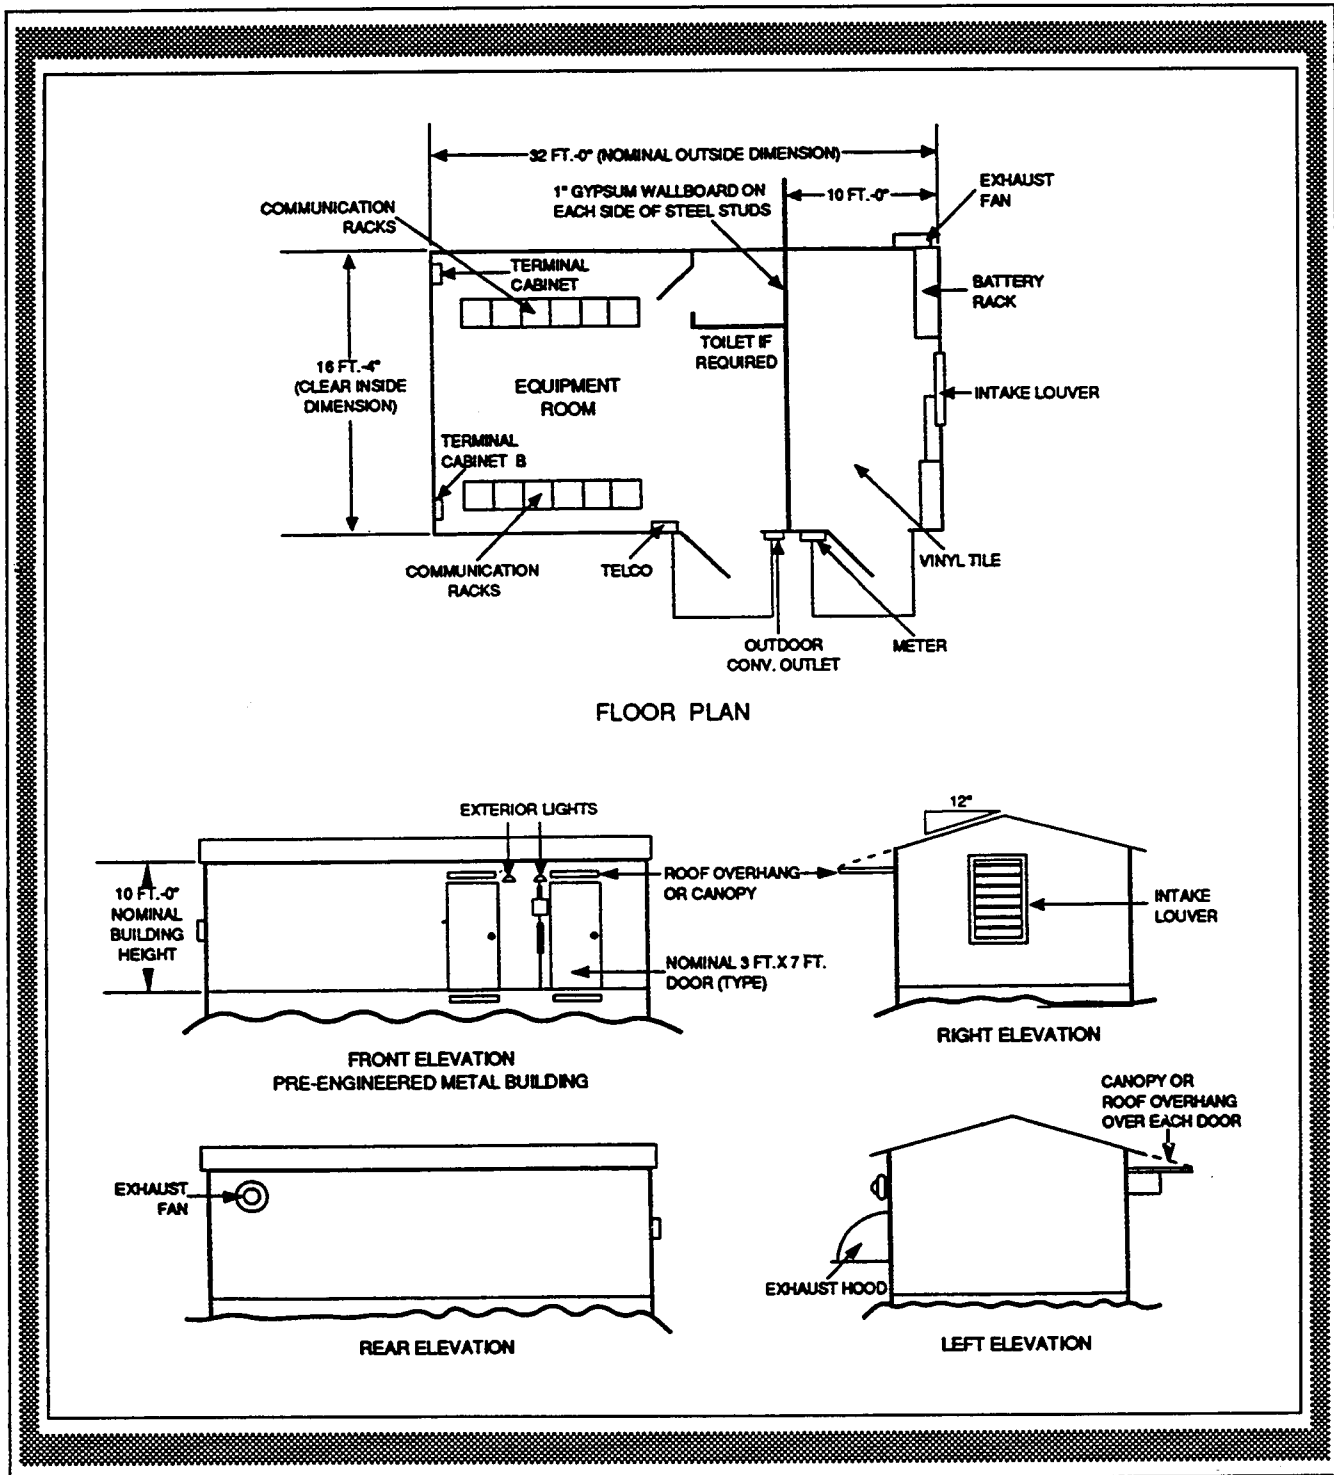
TYPICAL RCF/RCAG FLOOR PLAN WITH RACKS
